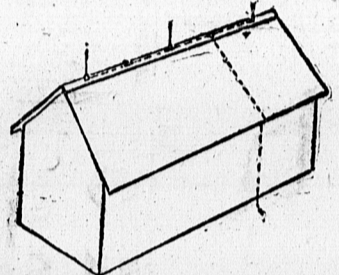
Method of placing lightning rods on a building having no cupola or chimney. Length of building about 10 feet.
